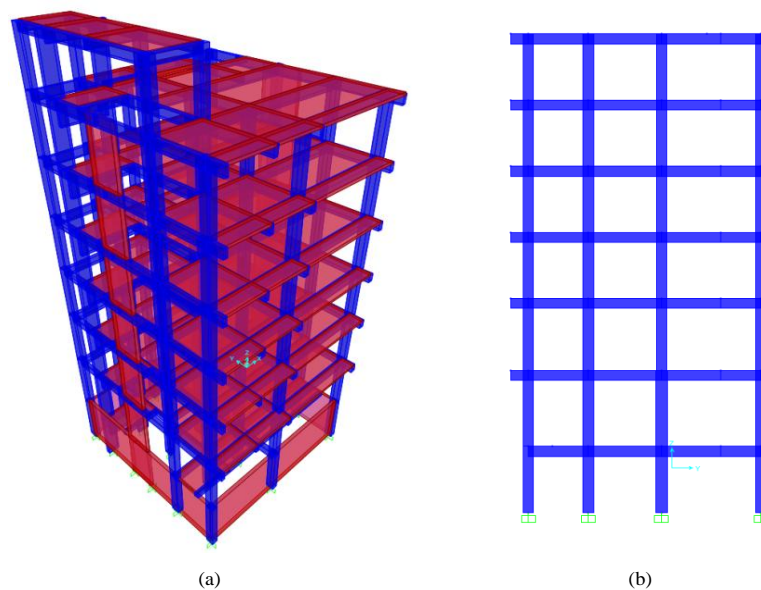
(a) FE model of the building (b) Side elevation of the building
